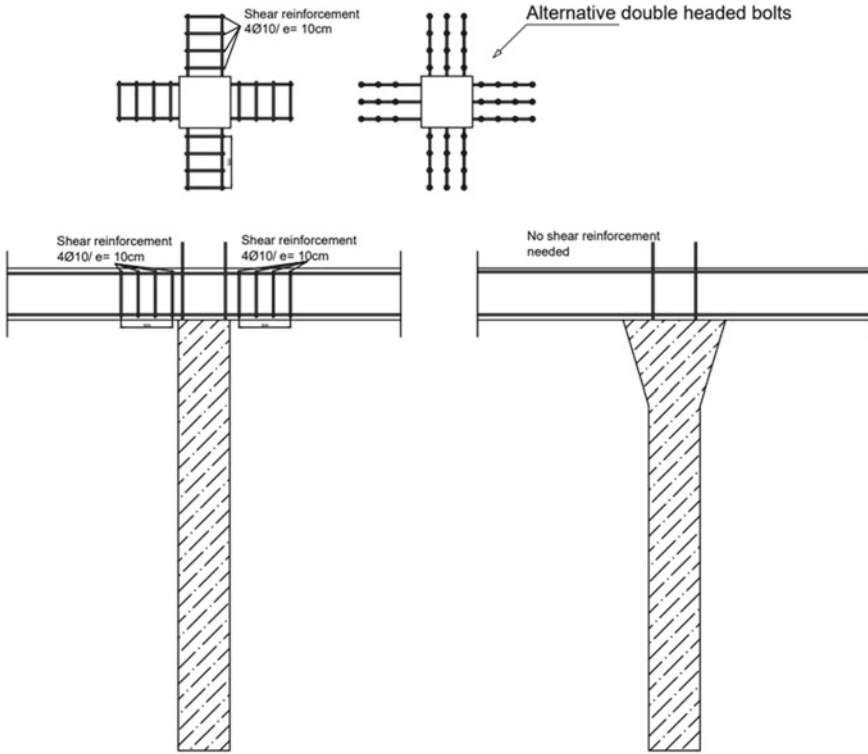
Schematic representation of column slab designs. Left: straight column with shear reinforcement. Right: Mushroom column without reinforcement. The two upper draws are the top view of the two types of shear reinforcement structures
